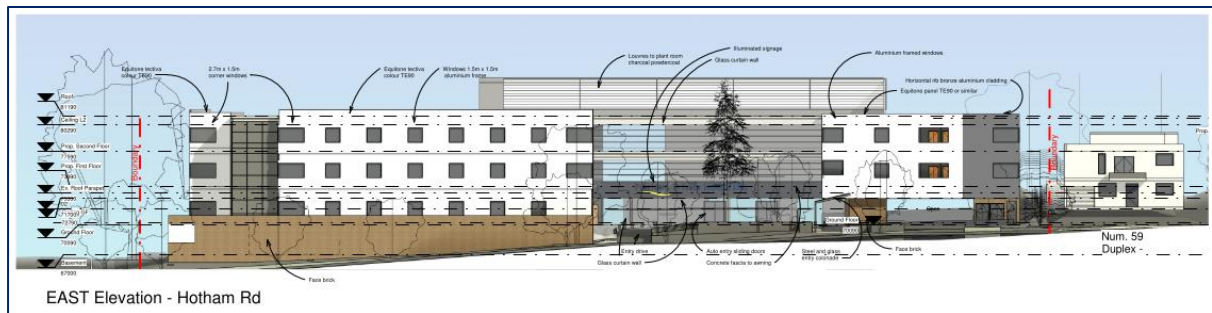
| Proposed building elevation Hotham Road (Source: EIS(RFI) 2022)
